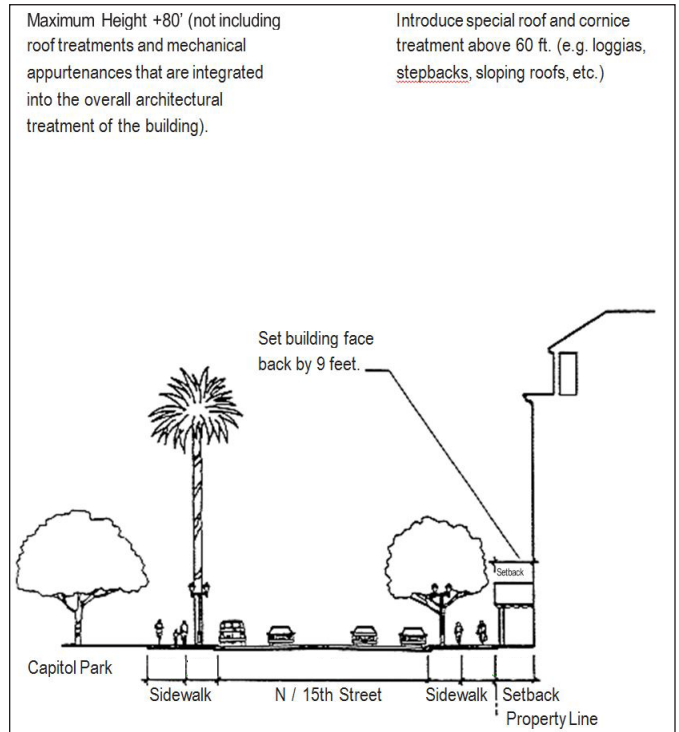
15th Street / N Street Park Edge Setback Requirements for Capitol View Protection
